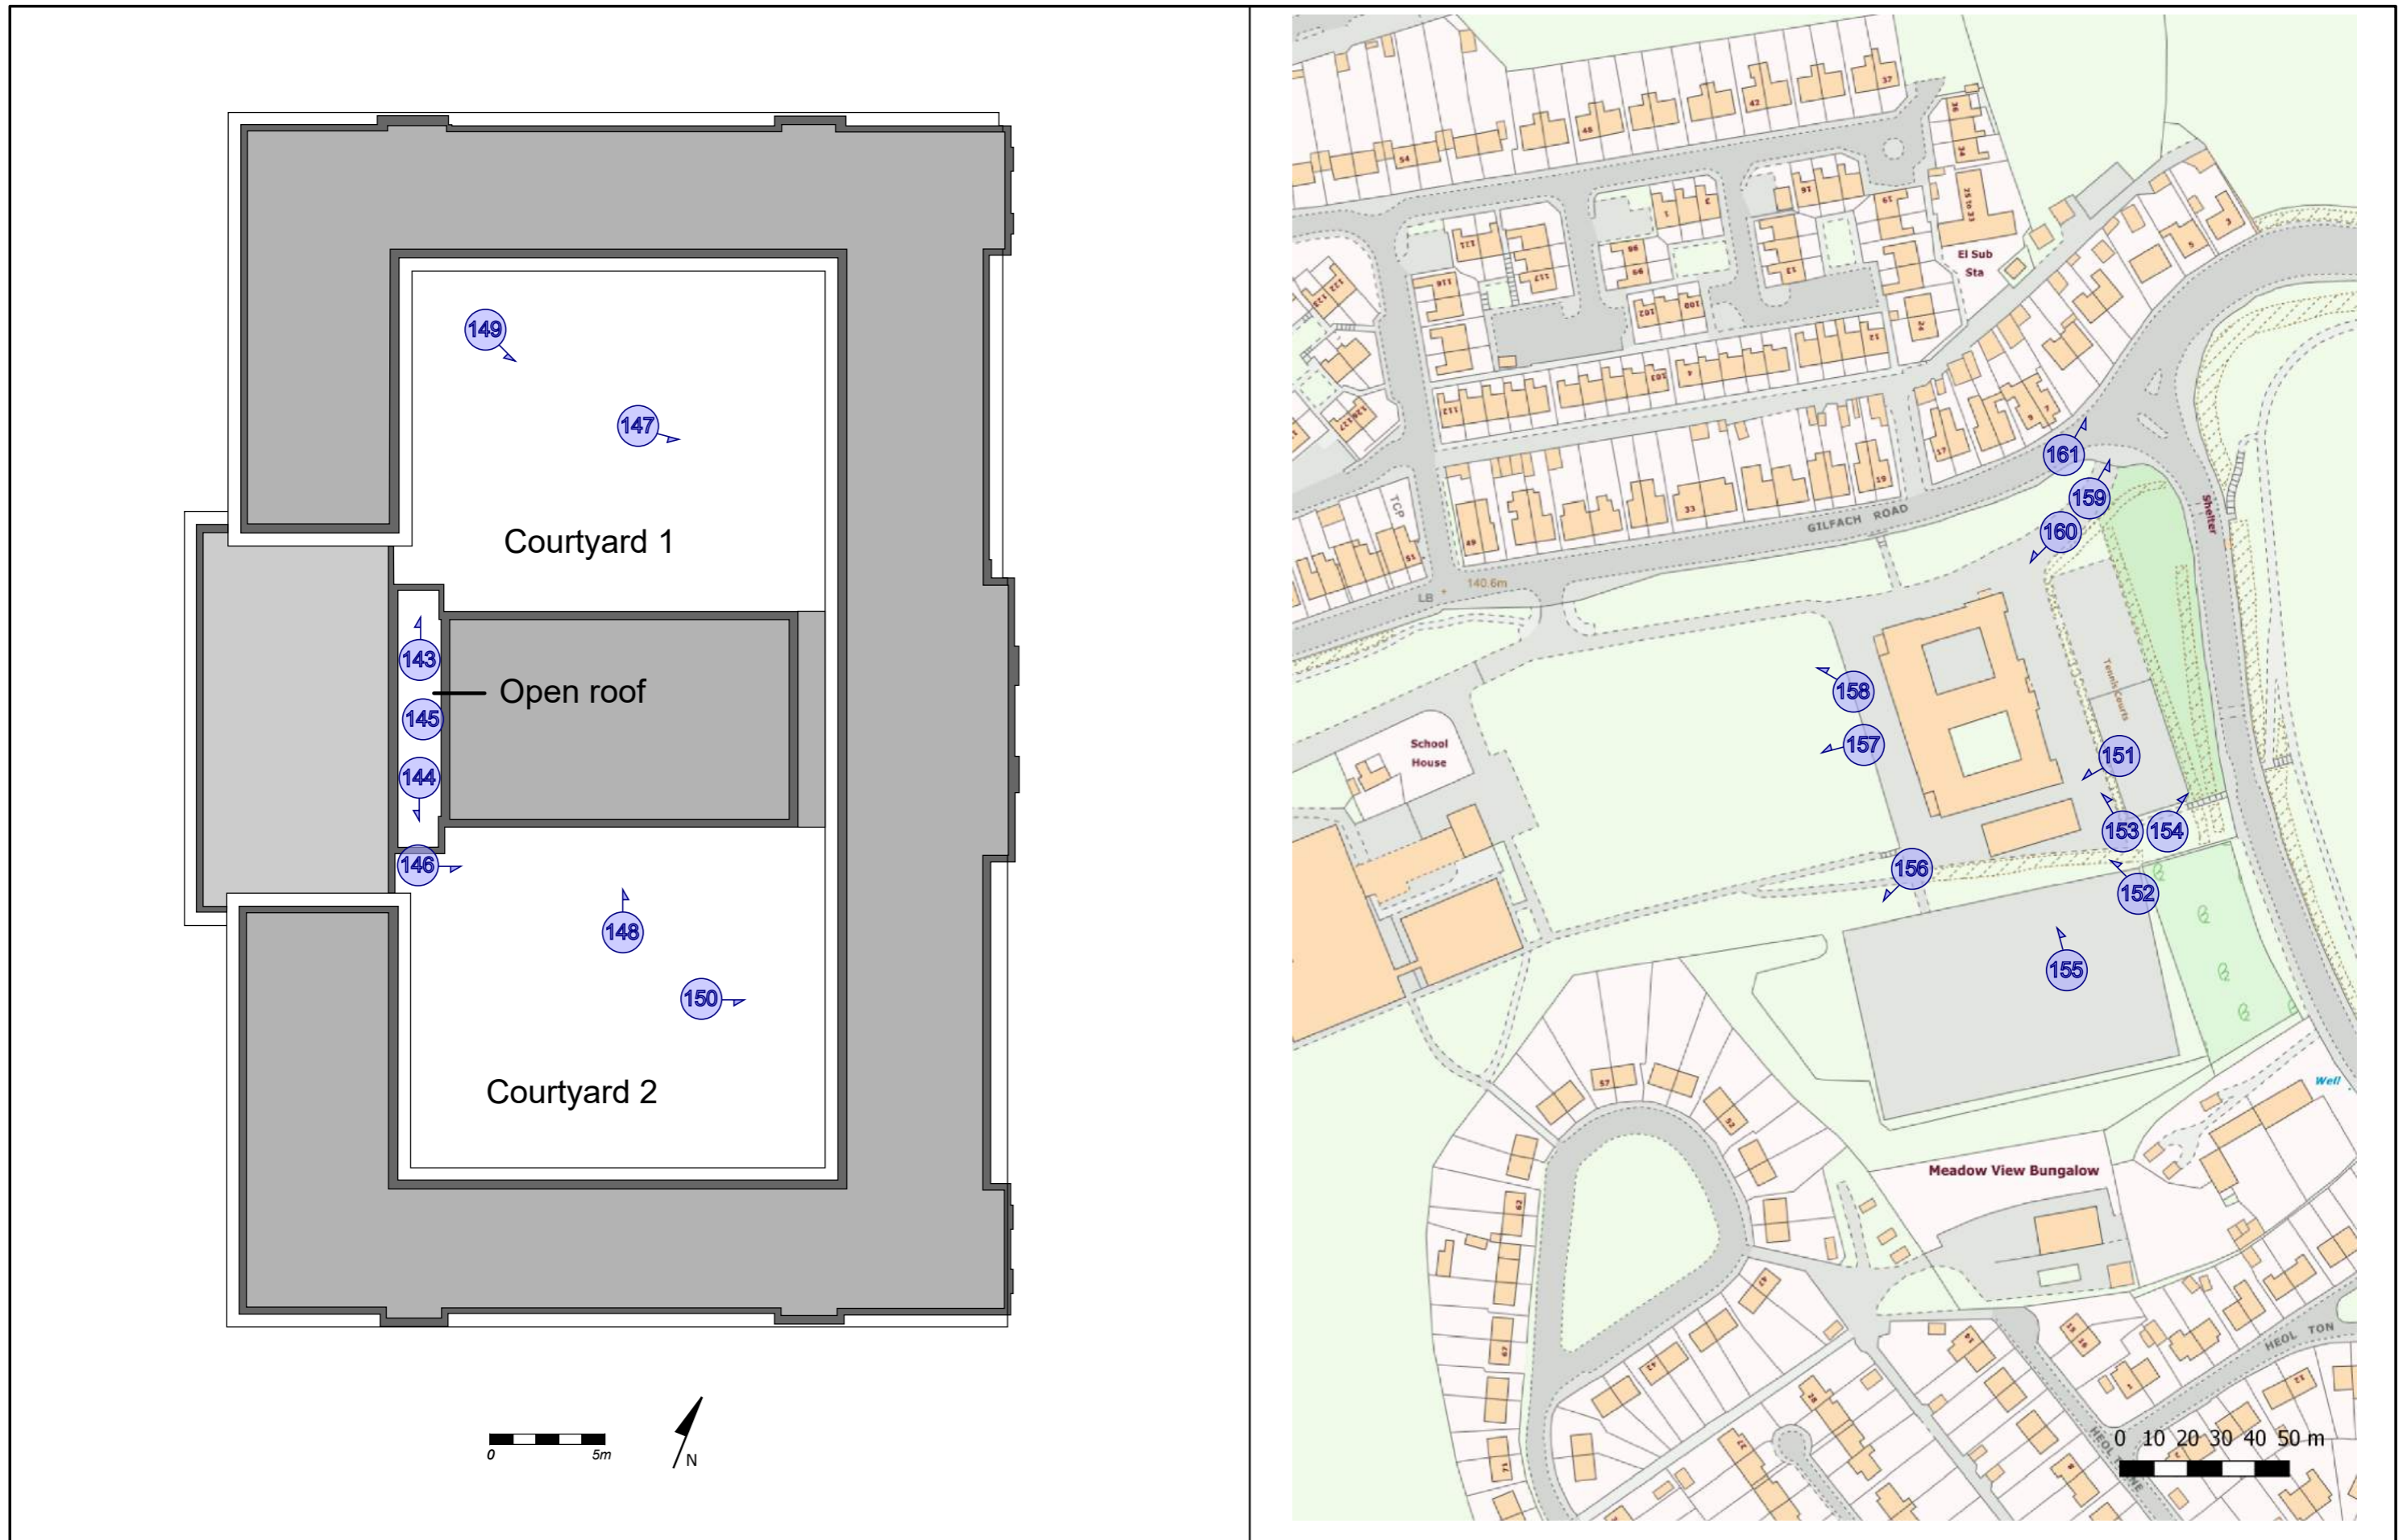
Plan of existing roof (left) and exterior views from school (right) with number and direction of taken shots.
